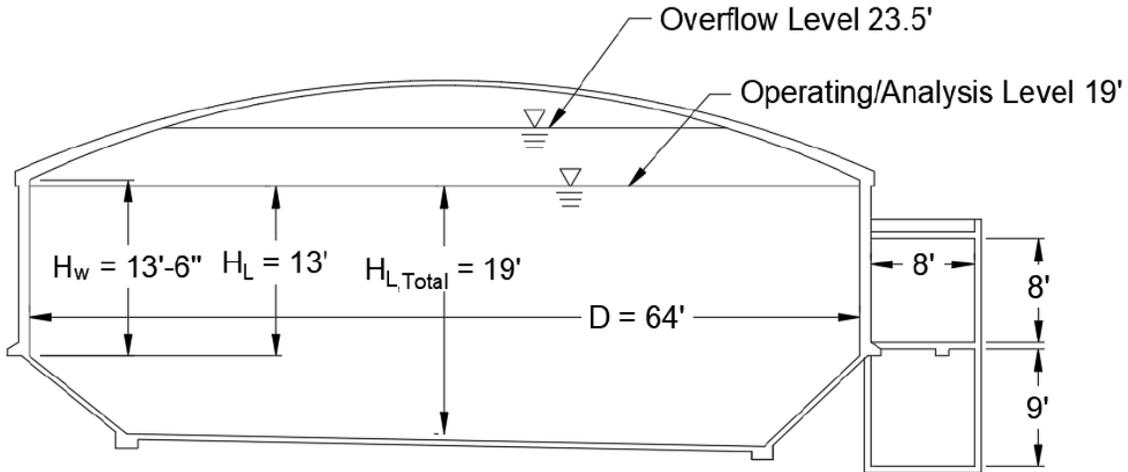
College Way Reservoir Elevations Schematic and Dimensions based on Field Measurements (H_w = Wall Height, H_L = Operating Water Height relative to Wall, $H_{L,Total}$ = Total Operating Water Height relative to Base)
